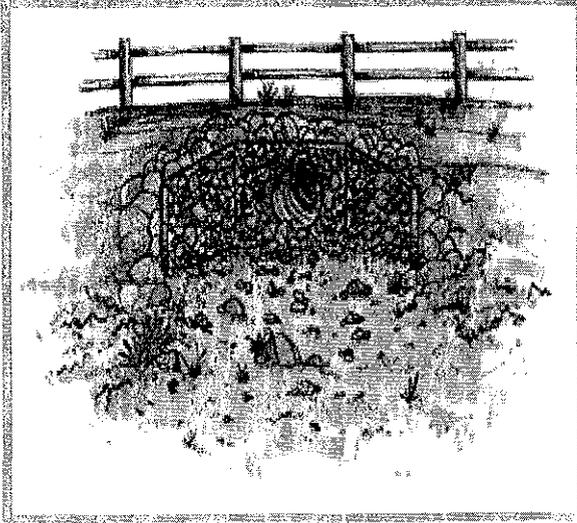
EXAMPLE OF CULVERT FACING TREATMENT
